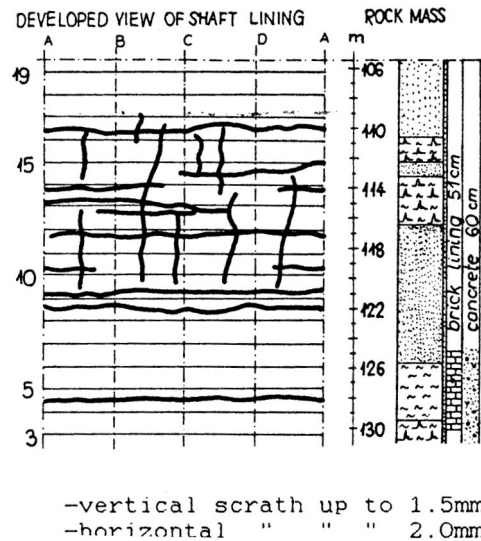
Cracking damages of concrete lining of P-6 shaft.
